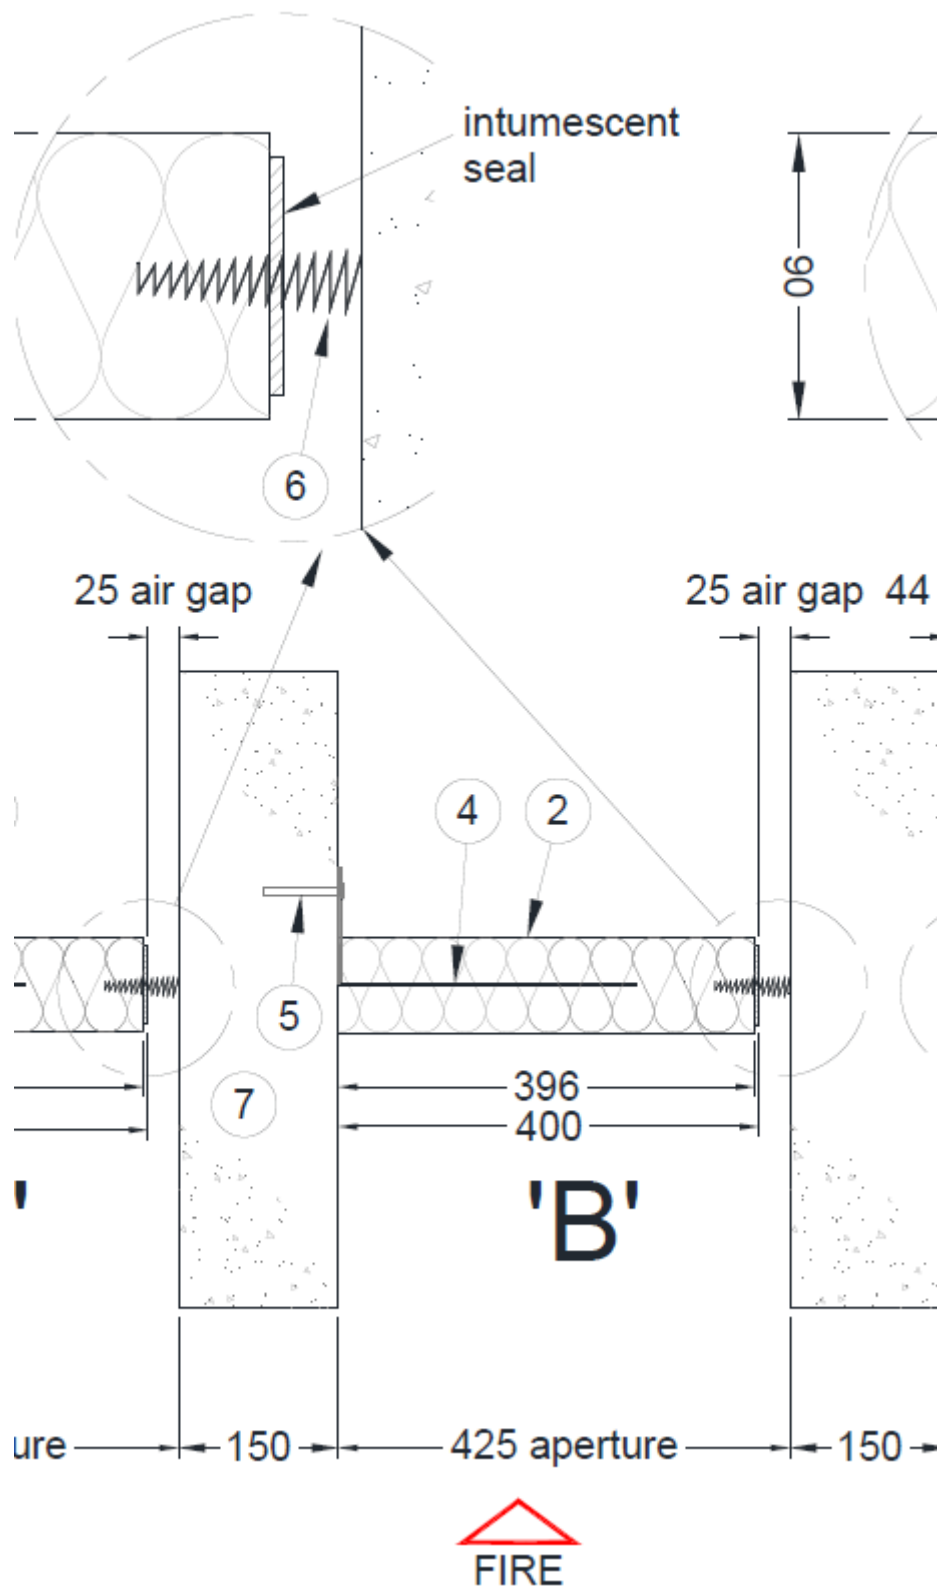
/01:02 – Test report WF399419 Cavity barrier B in 425mm wide aperture
